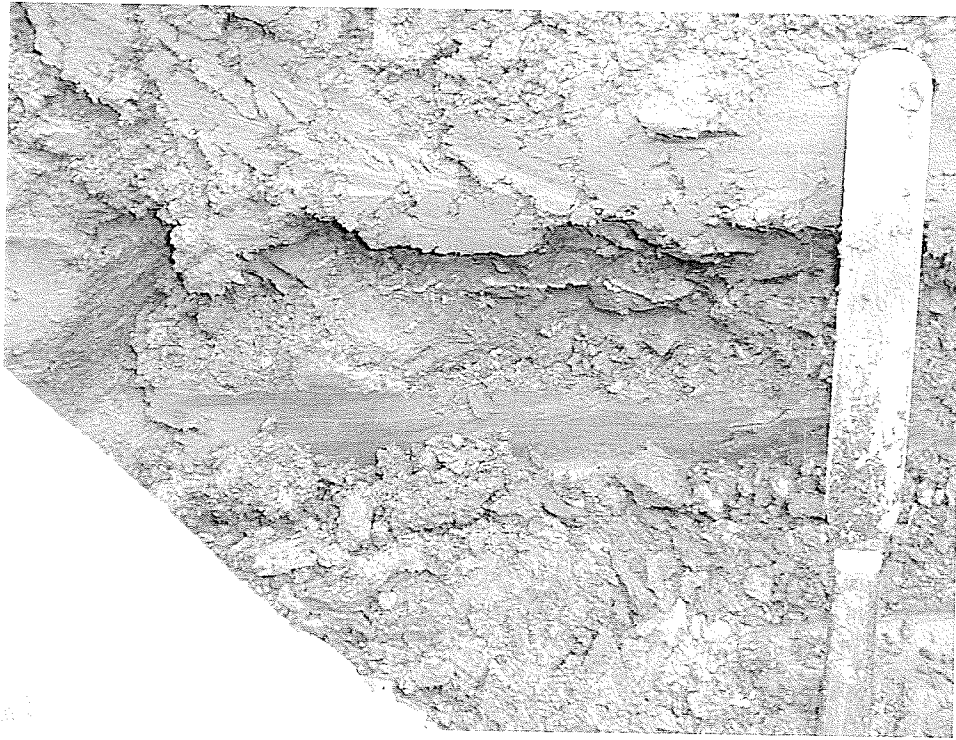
Possible failure surface on west wall of Test pit 2.
